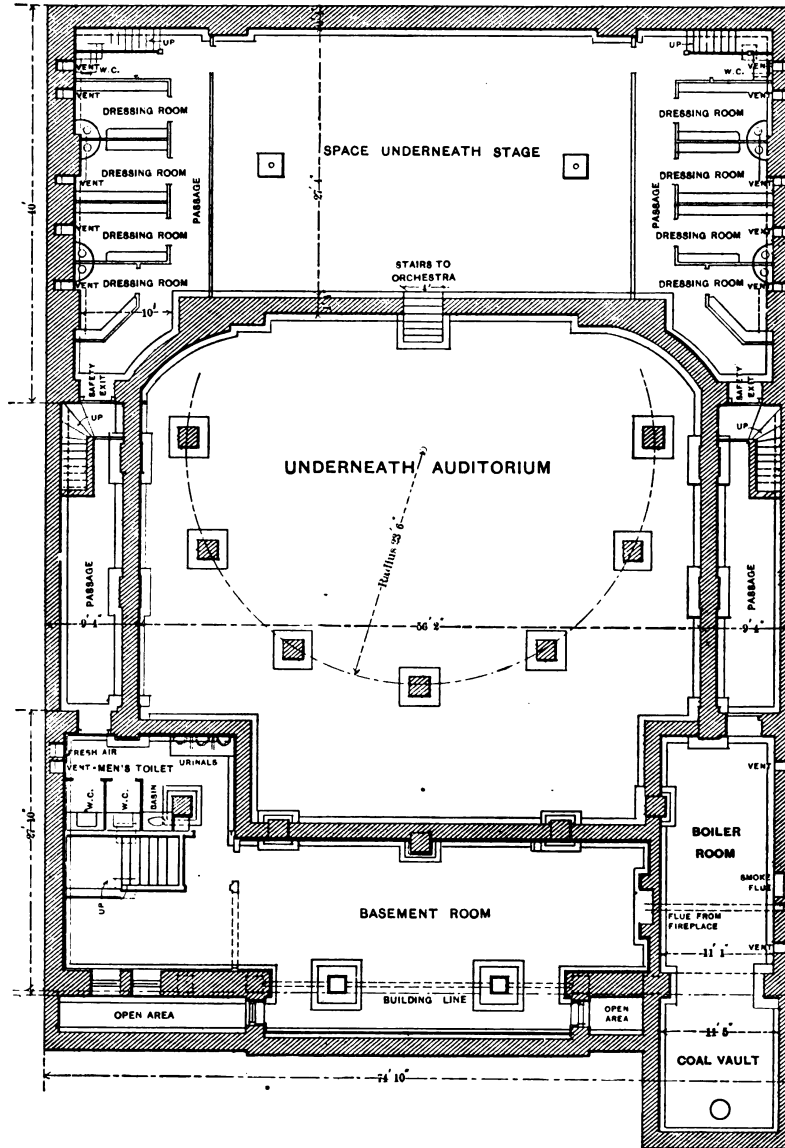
Basement Plan of Harrigan's Theater—Scale, 1-16 Inch to the Foot.
